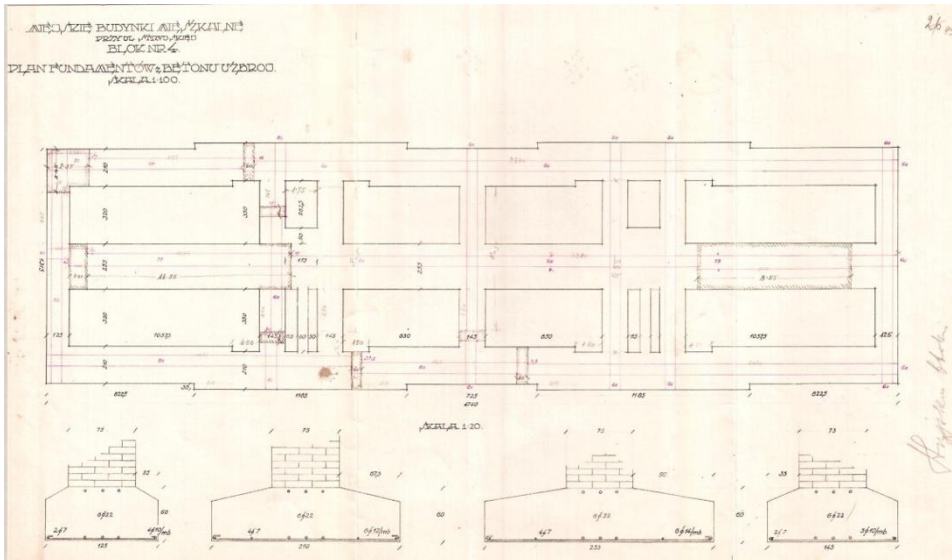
Plan of the foundation structures of the buildings on Stryiska Street. Design by Michal Ryba, 1928 [24]
